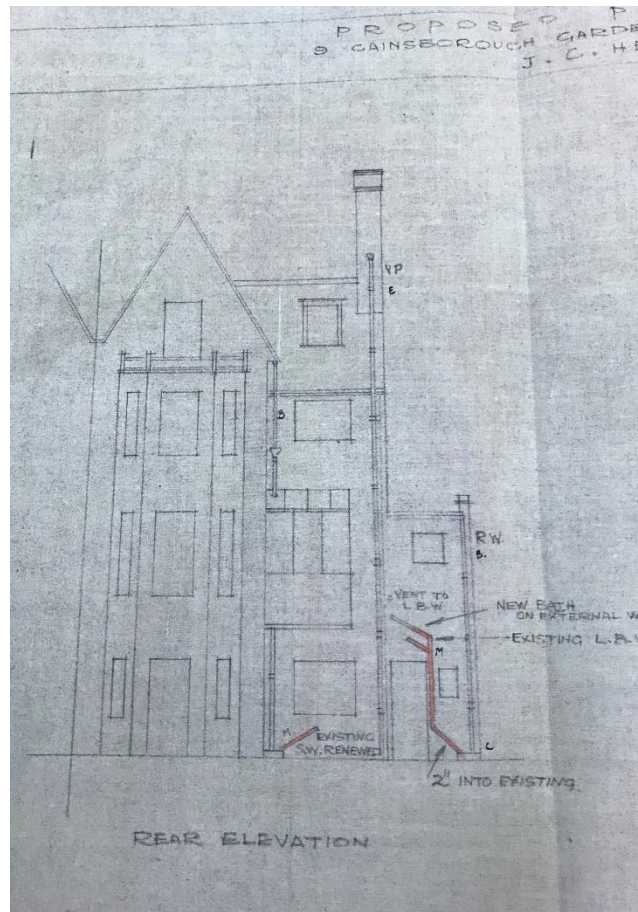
Drainage Plan submitted (elevation) submitted in 1948. Source: Camden Records Office
